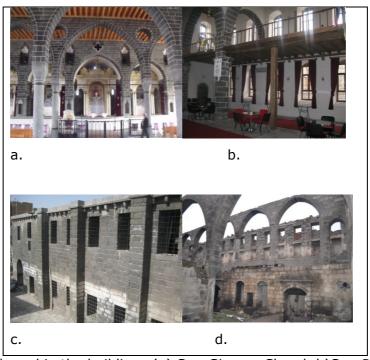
Material used in the buildings (a) SurpGiragos Church b)SurpPirgiç Church c)
